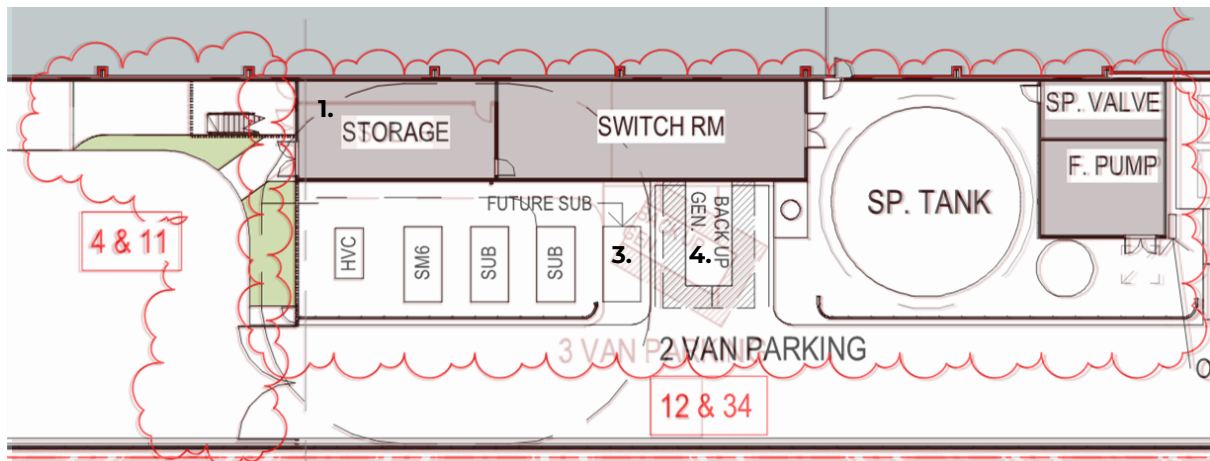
Revised Plant Area Layout (Source: Nettleton Tribe, 2022)
